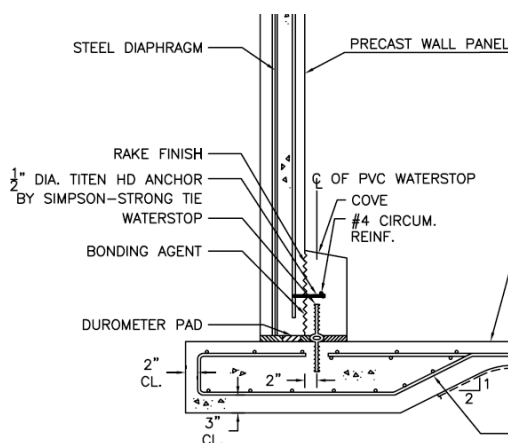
Type III Wall-Floor Connection (© Natgun Corporation)
